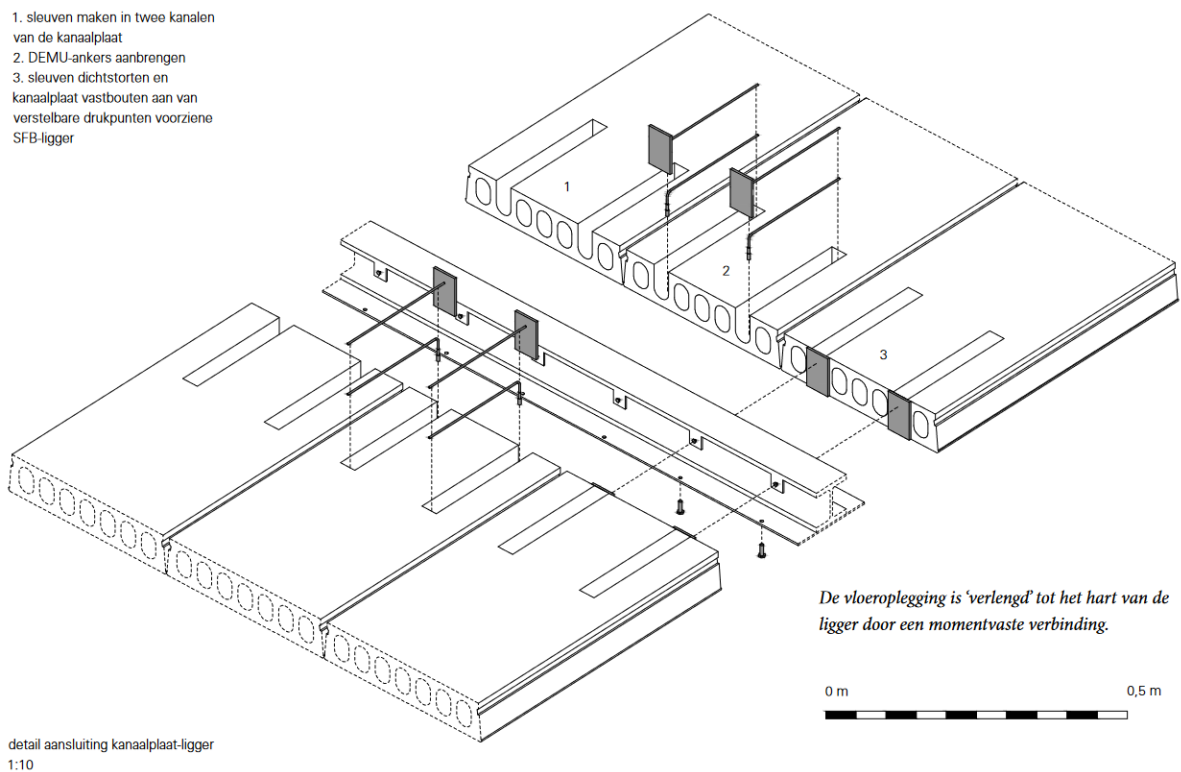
Hollow core slab connection temporary courthouse Amsterdam [39]
